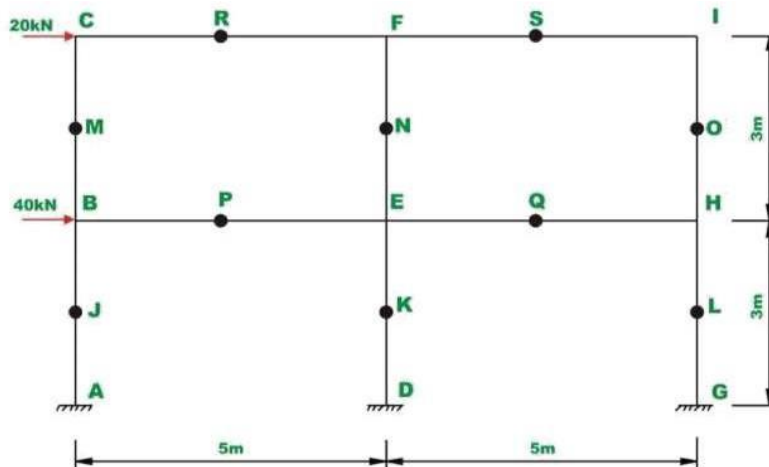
Two storey building frame subjected to lateral load of Example 36.2
